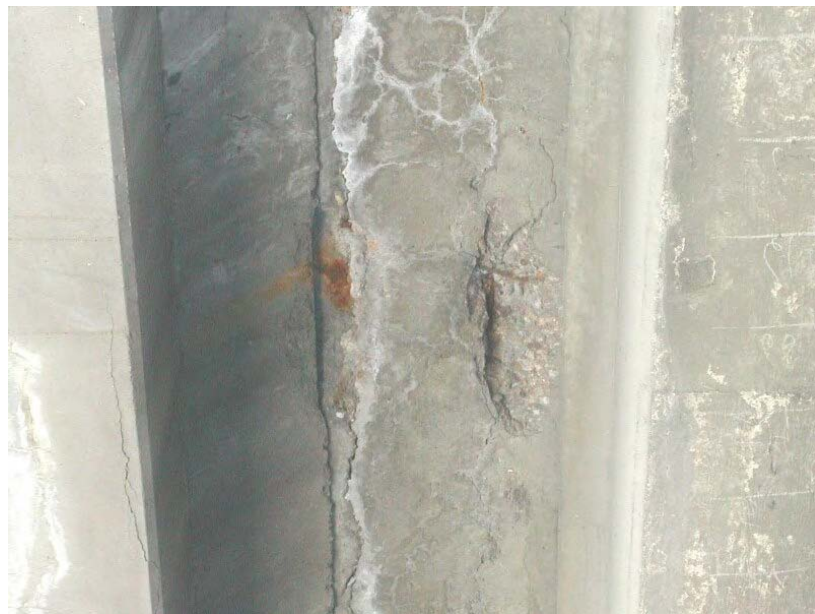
Cracking and efflorescence on the bottom deck
